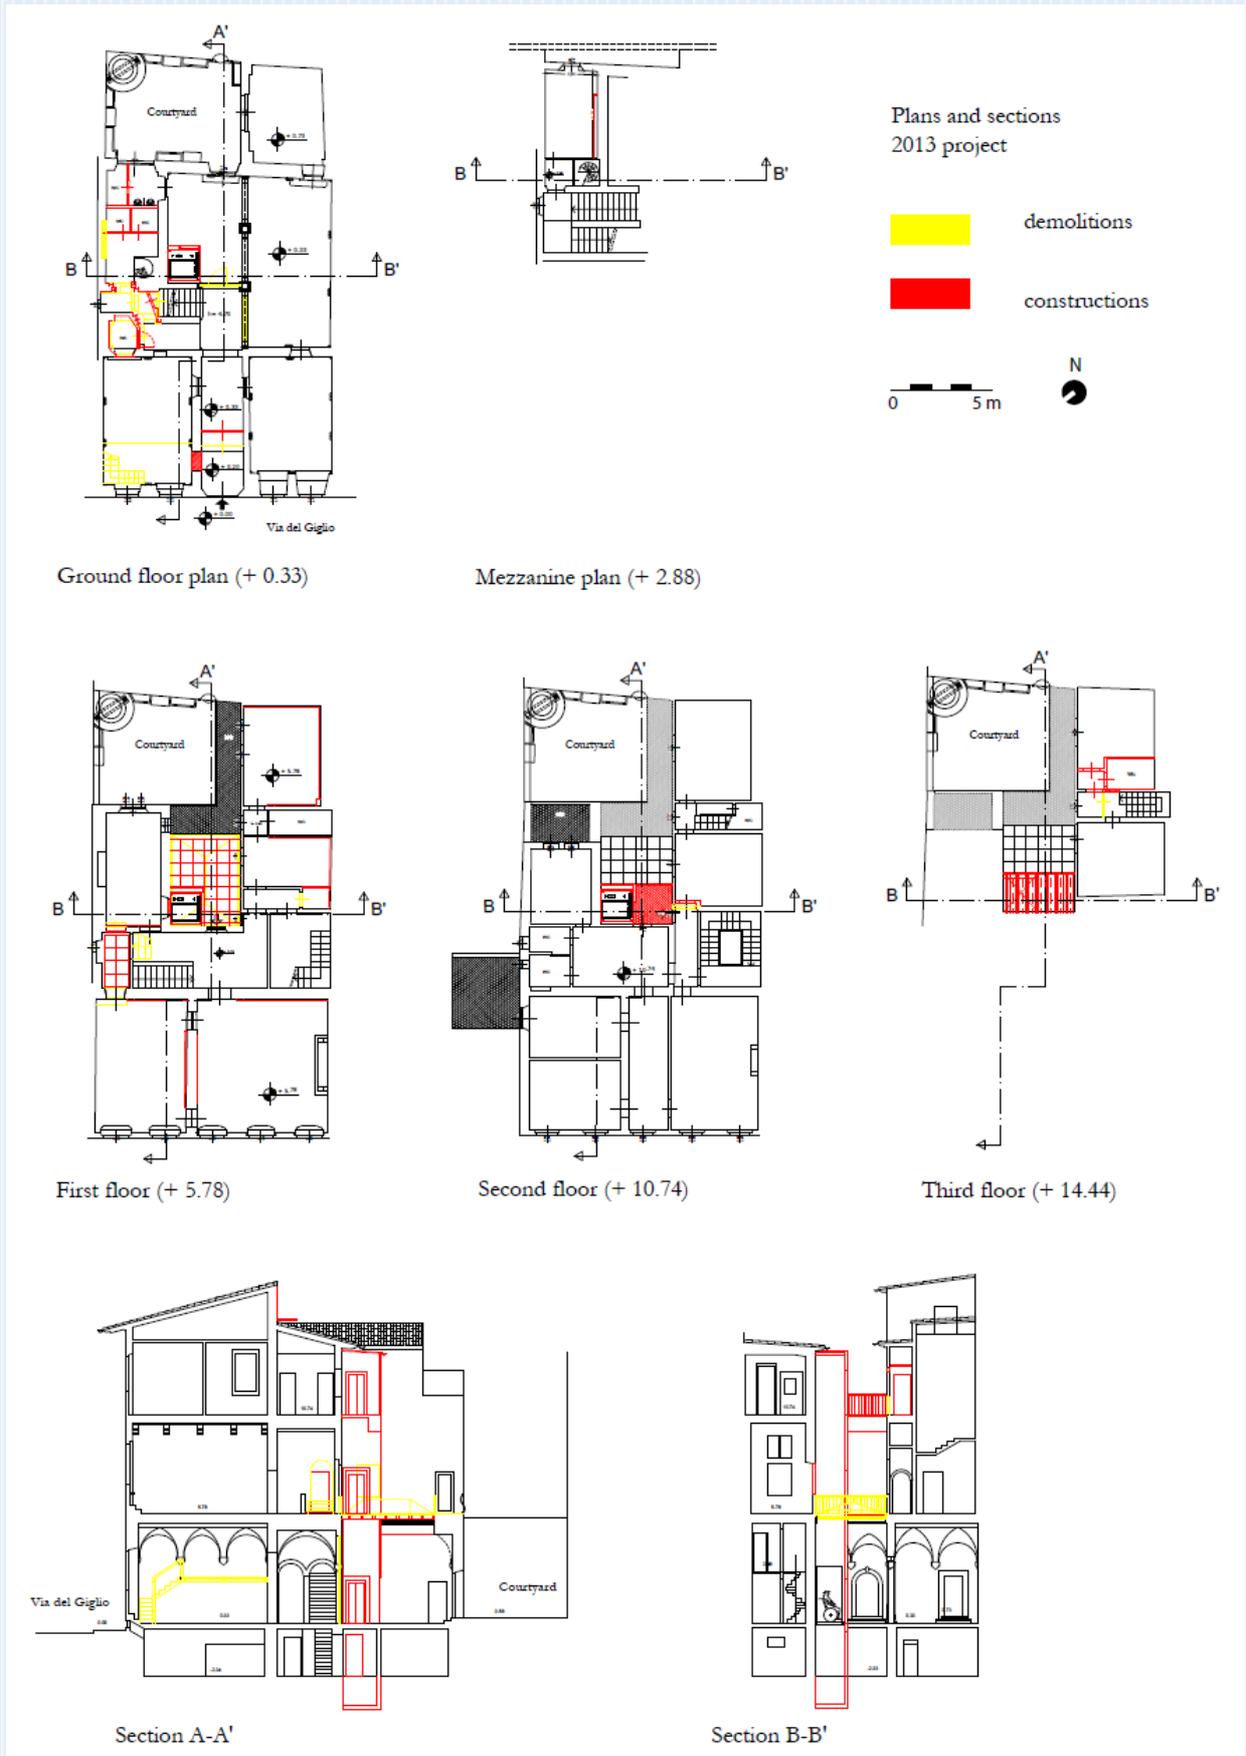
Plans and sections of the 2013 project with in red the constructions and in yellow the demolitions.
